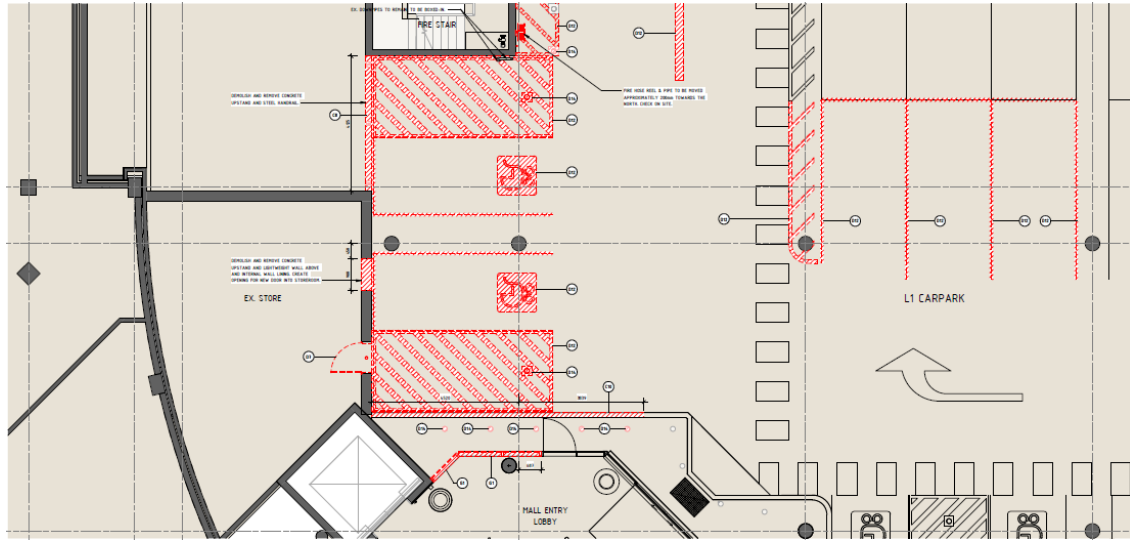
Demolition Plan for the proposed amenities block – Level 1, Warringah Mall
